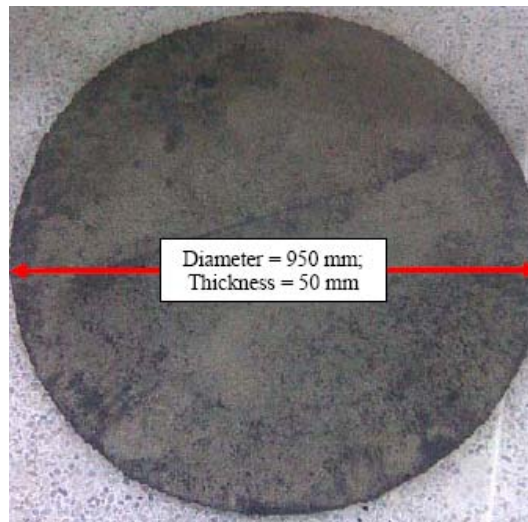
Asphaltic concrete specimen for modeling asphaltic concrete layer.
